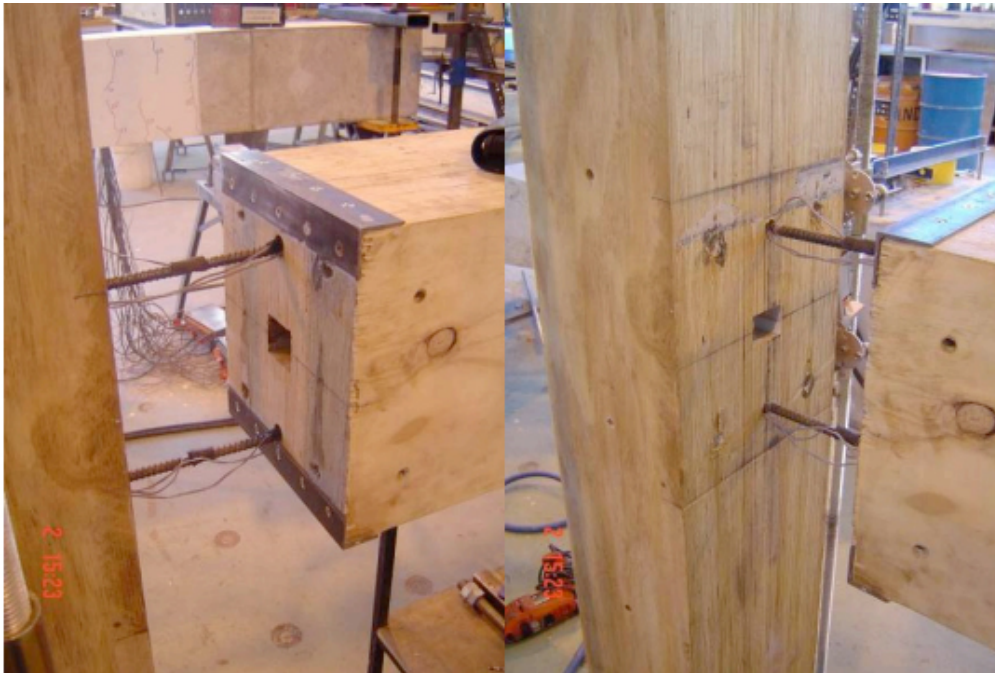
Beam edge reinforcement with steel angles (Newcombe, 2005)
